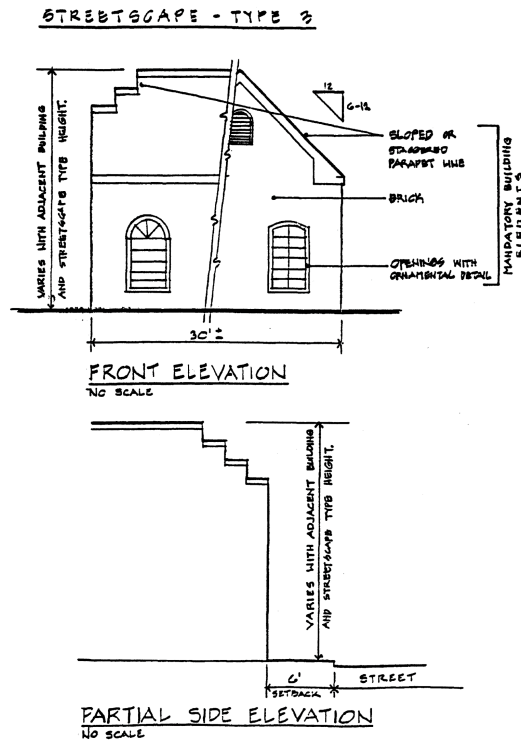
BRICK STRUCTURES DISTRICT-STREETSCAPE, TYPE 3
